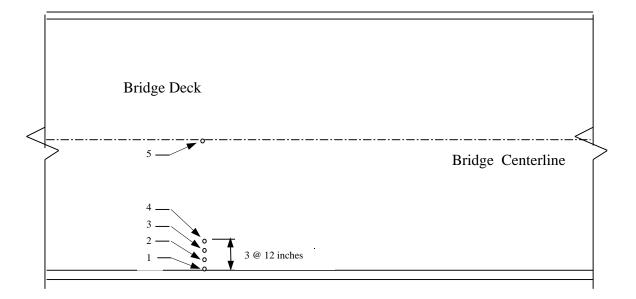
Field Concrete Powder Sample Locations (X-powders)
